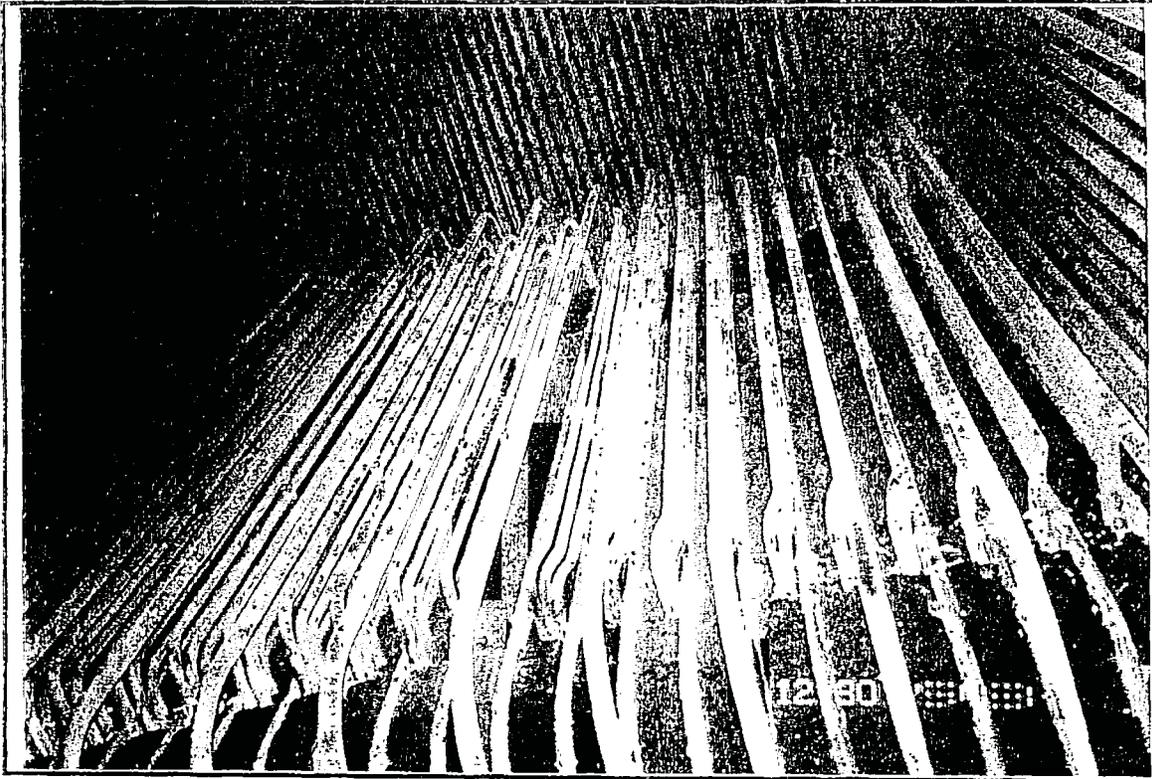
INTERIOR VIEW OF BOILER 17 UPPER WALL.
